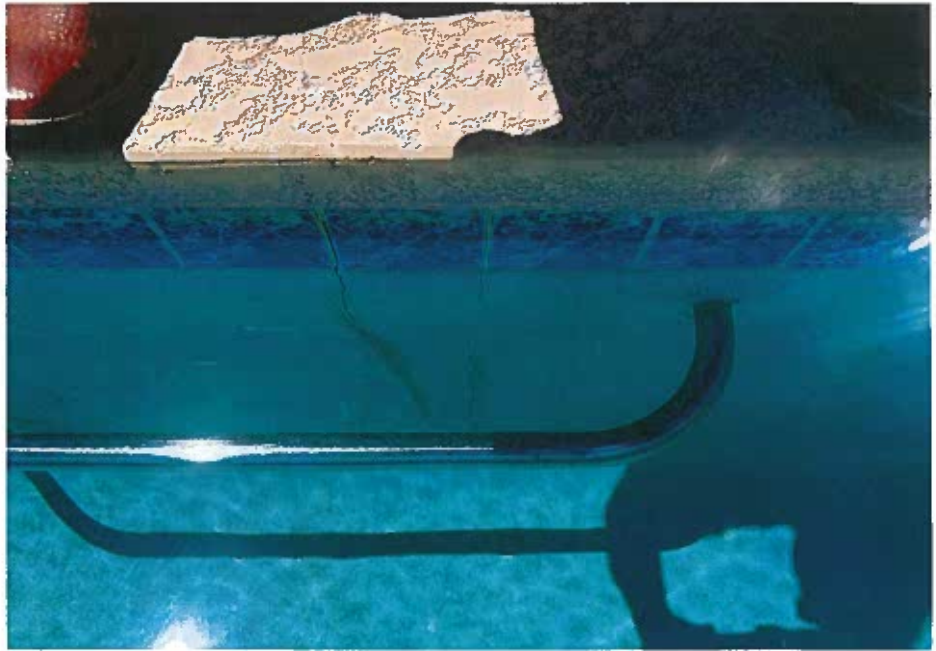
Concrete Desc - Slab Settlement and Joint Separation
